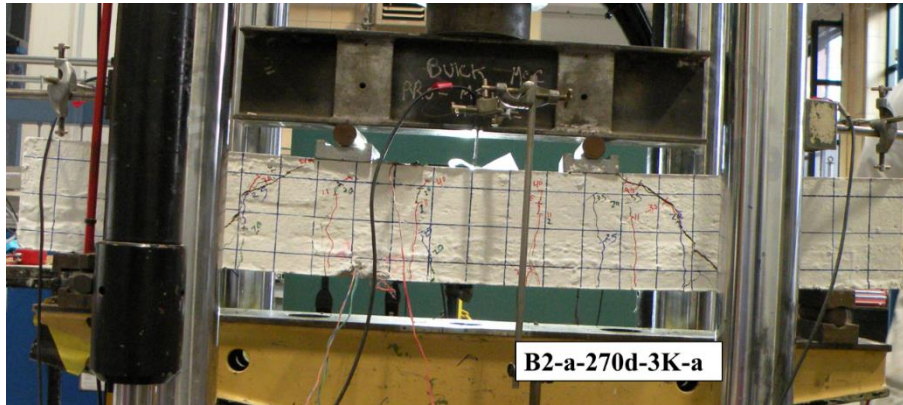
Crack pattern and failure mode of beam1 loaded and stored in lab.
